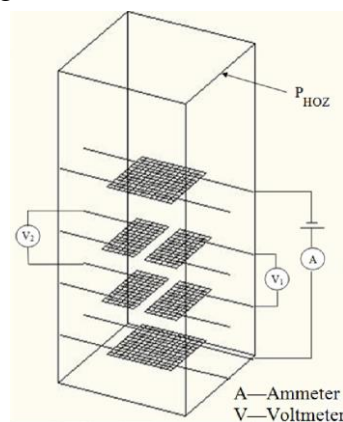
Wire mesh configuration inside short column tested by Howser et al. (2011)
